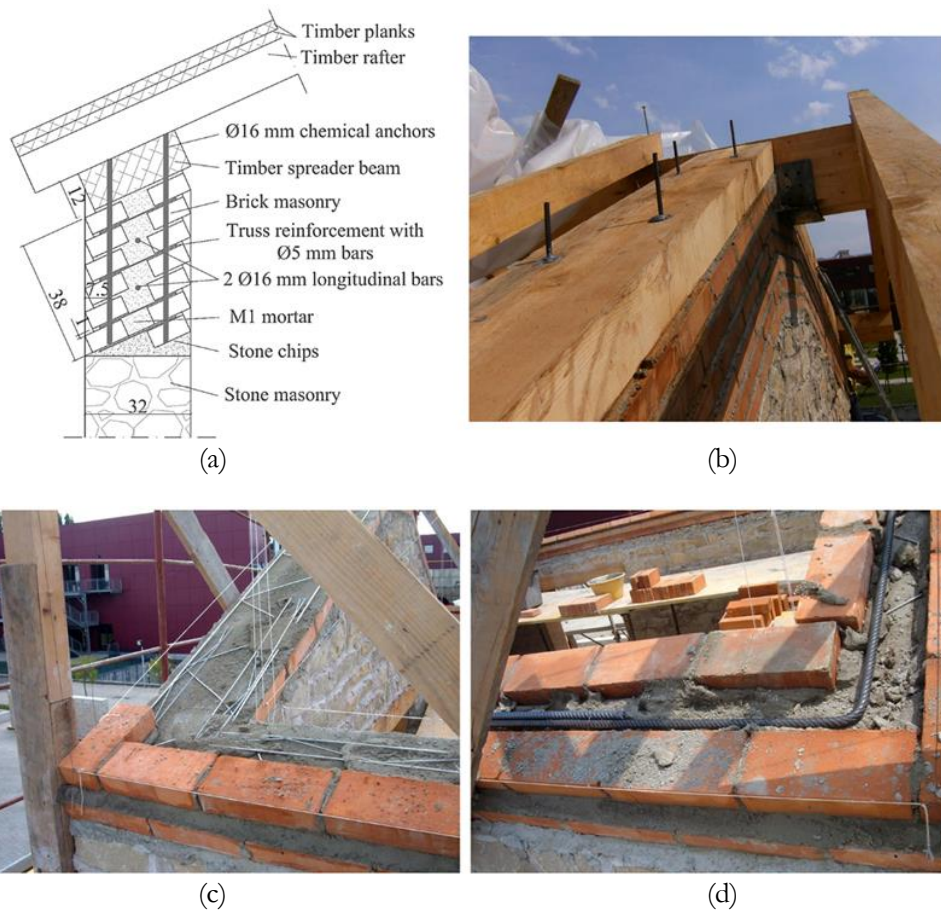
Building 2, retrofit at the roof level: (a) structural detail of the RM ring beam; (b) timber spreader and ridge beams connected to the RM ring beam above a gable; (c) horizontal truss reinforcement at corner; d) longitudinal reinforcing bars at corner. Units of *cm*.
